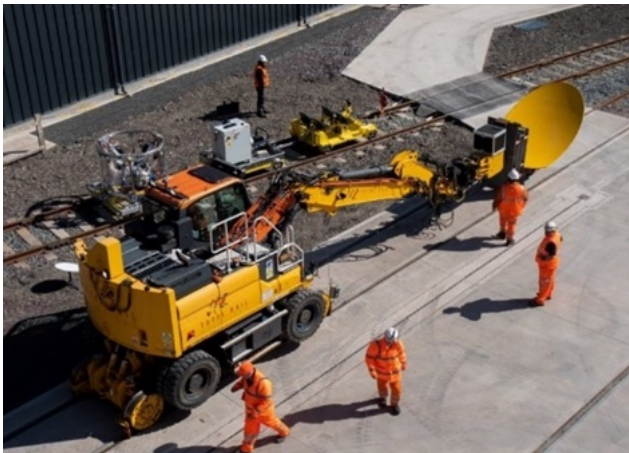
Tunnel sub-surface inspection radar mounted on a road rail vehicle
